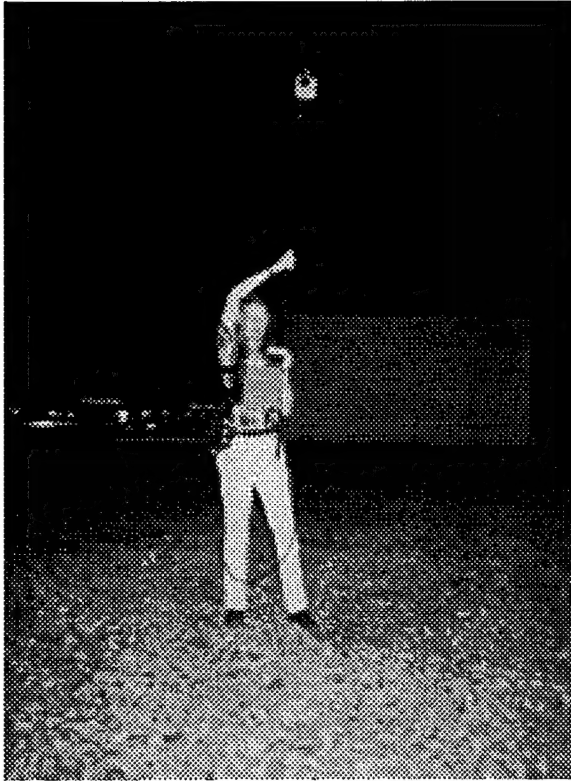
Conducting nighttime on-the-roof infrared roof moisture surveys. We found it quite valuable to observe the roof from as high a vantage point as possible.
